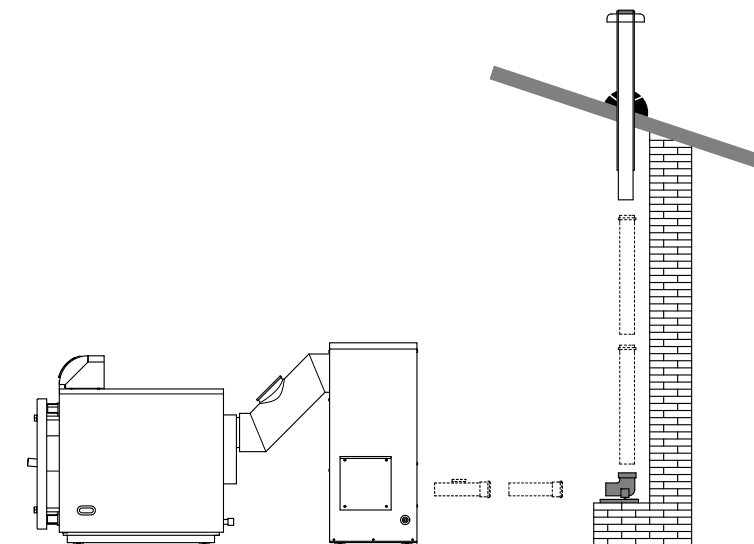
Exhaust gas system SAS 160 - Exhaust gas pipe in the duct (example: LogoCondens LC 54/LC 78)
